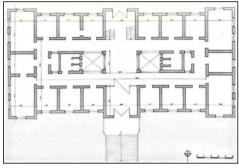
Trabzon Government Office, Ground Floor Plan, (Özen - Tuluk vd. 2010, 223)
